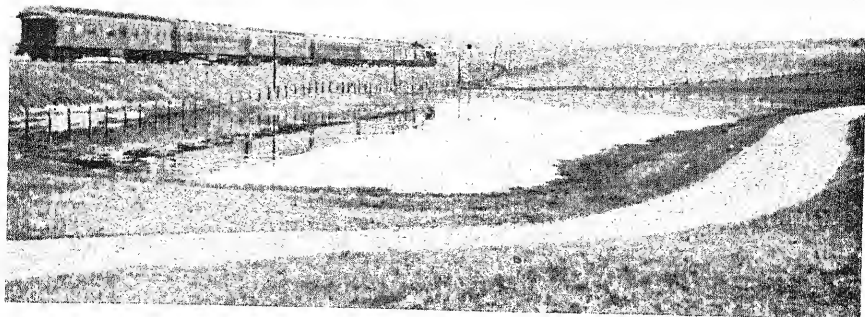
Ponding behind a railroad embankment, caused by an improperly placed culvert
